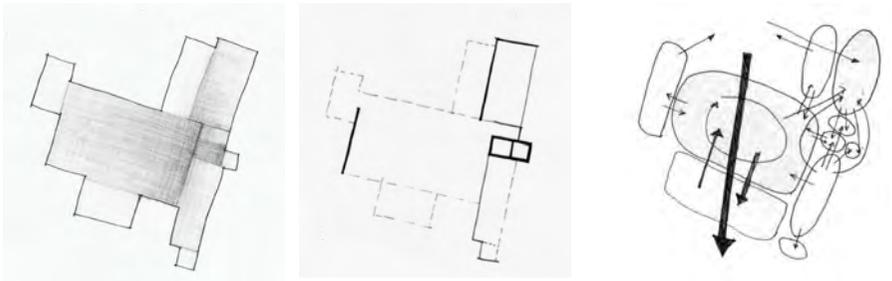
Diagrammatic floor planning exploring light entry, privacy and circulation
